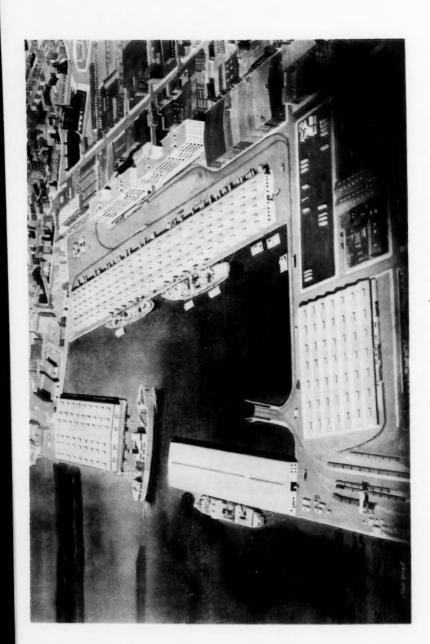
Artist's Drawing of Completed Pier 11 at Right and Atlantic Basin Area
